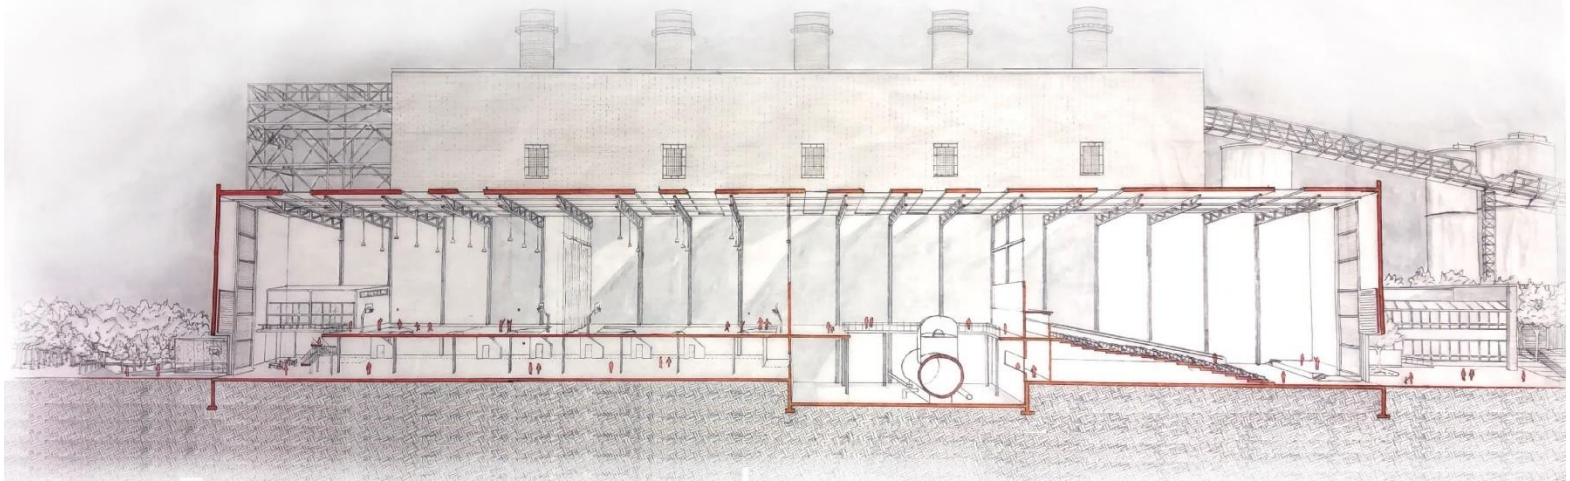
Section Perspective - Transformed Turbine Room (source: Author)
